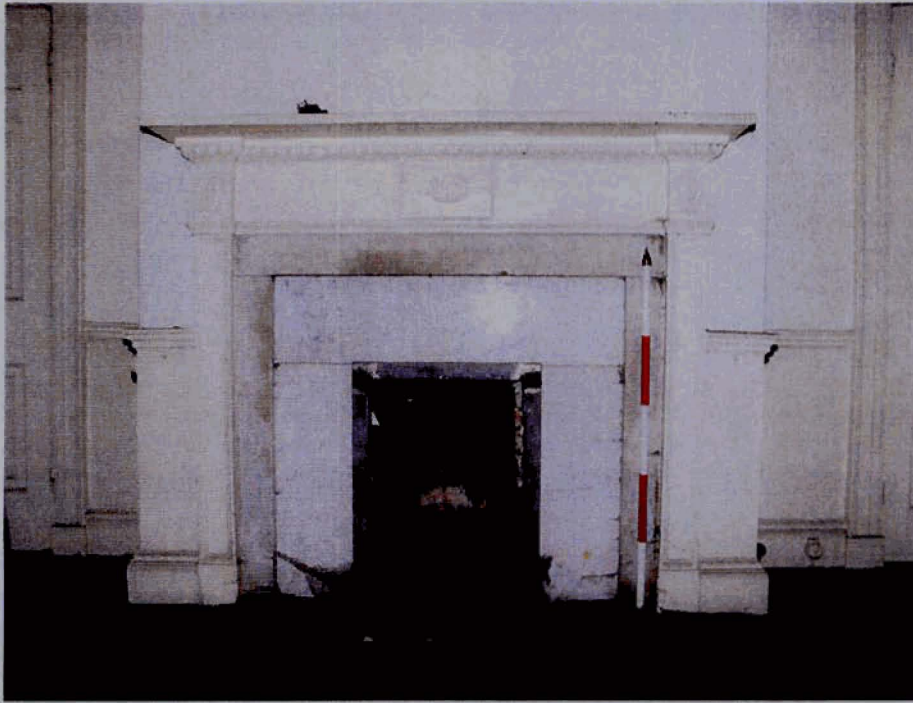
Chimney piece in ground floor east bay in Building 1 taken from E
